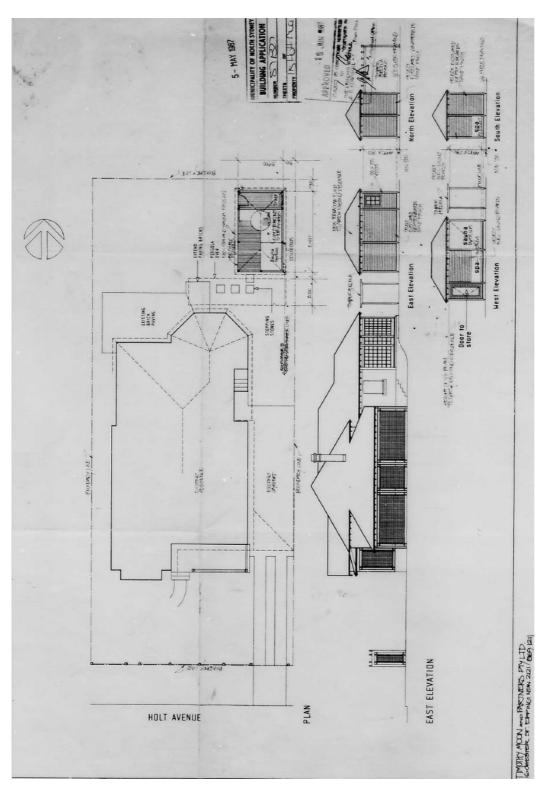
Proposed new spa and sauna pavilion, 115 Holt Avenue, Cremorne, April 1987. (Source: NSC, DA 87/327)
